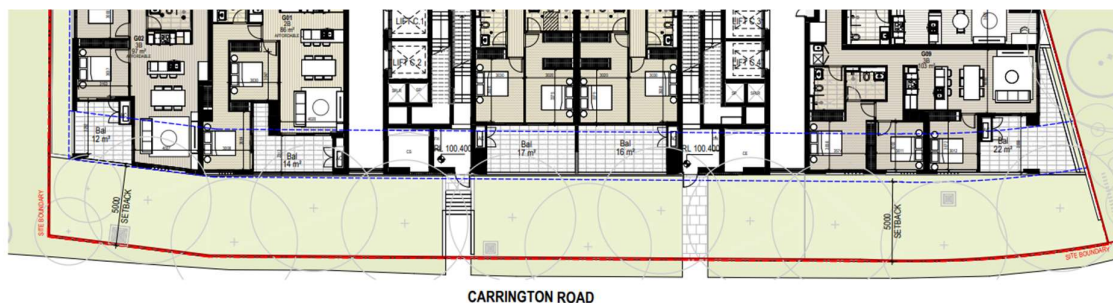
Previously submitted SSDA scheme with no access provided from Carrington Road at ground floor level (Source: Group GSA)
